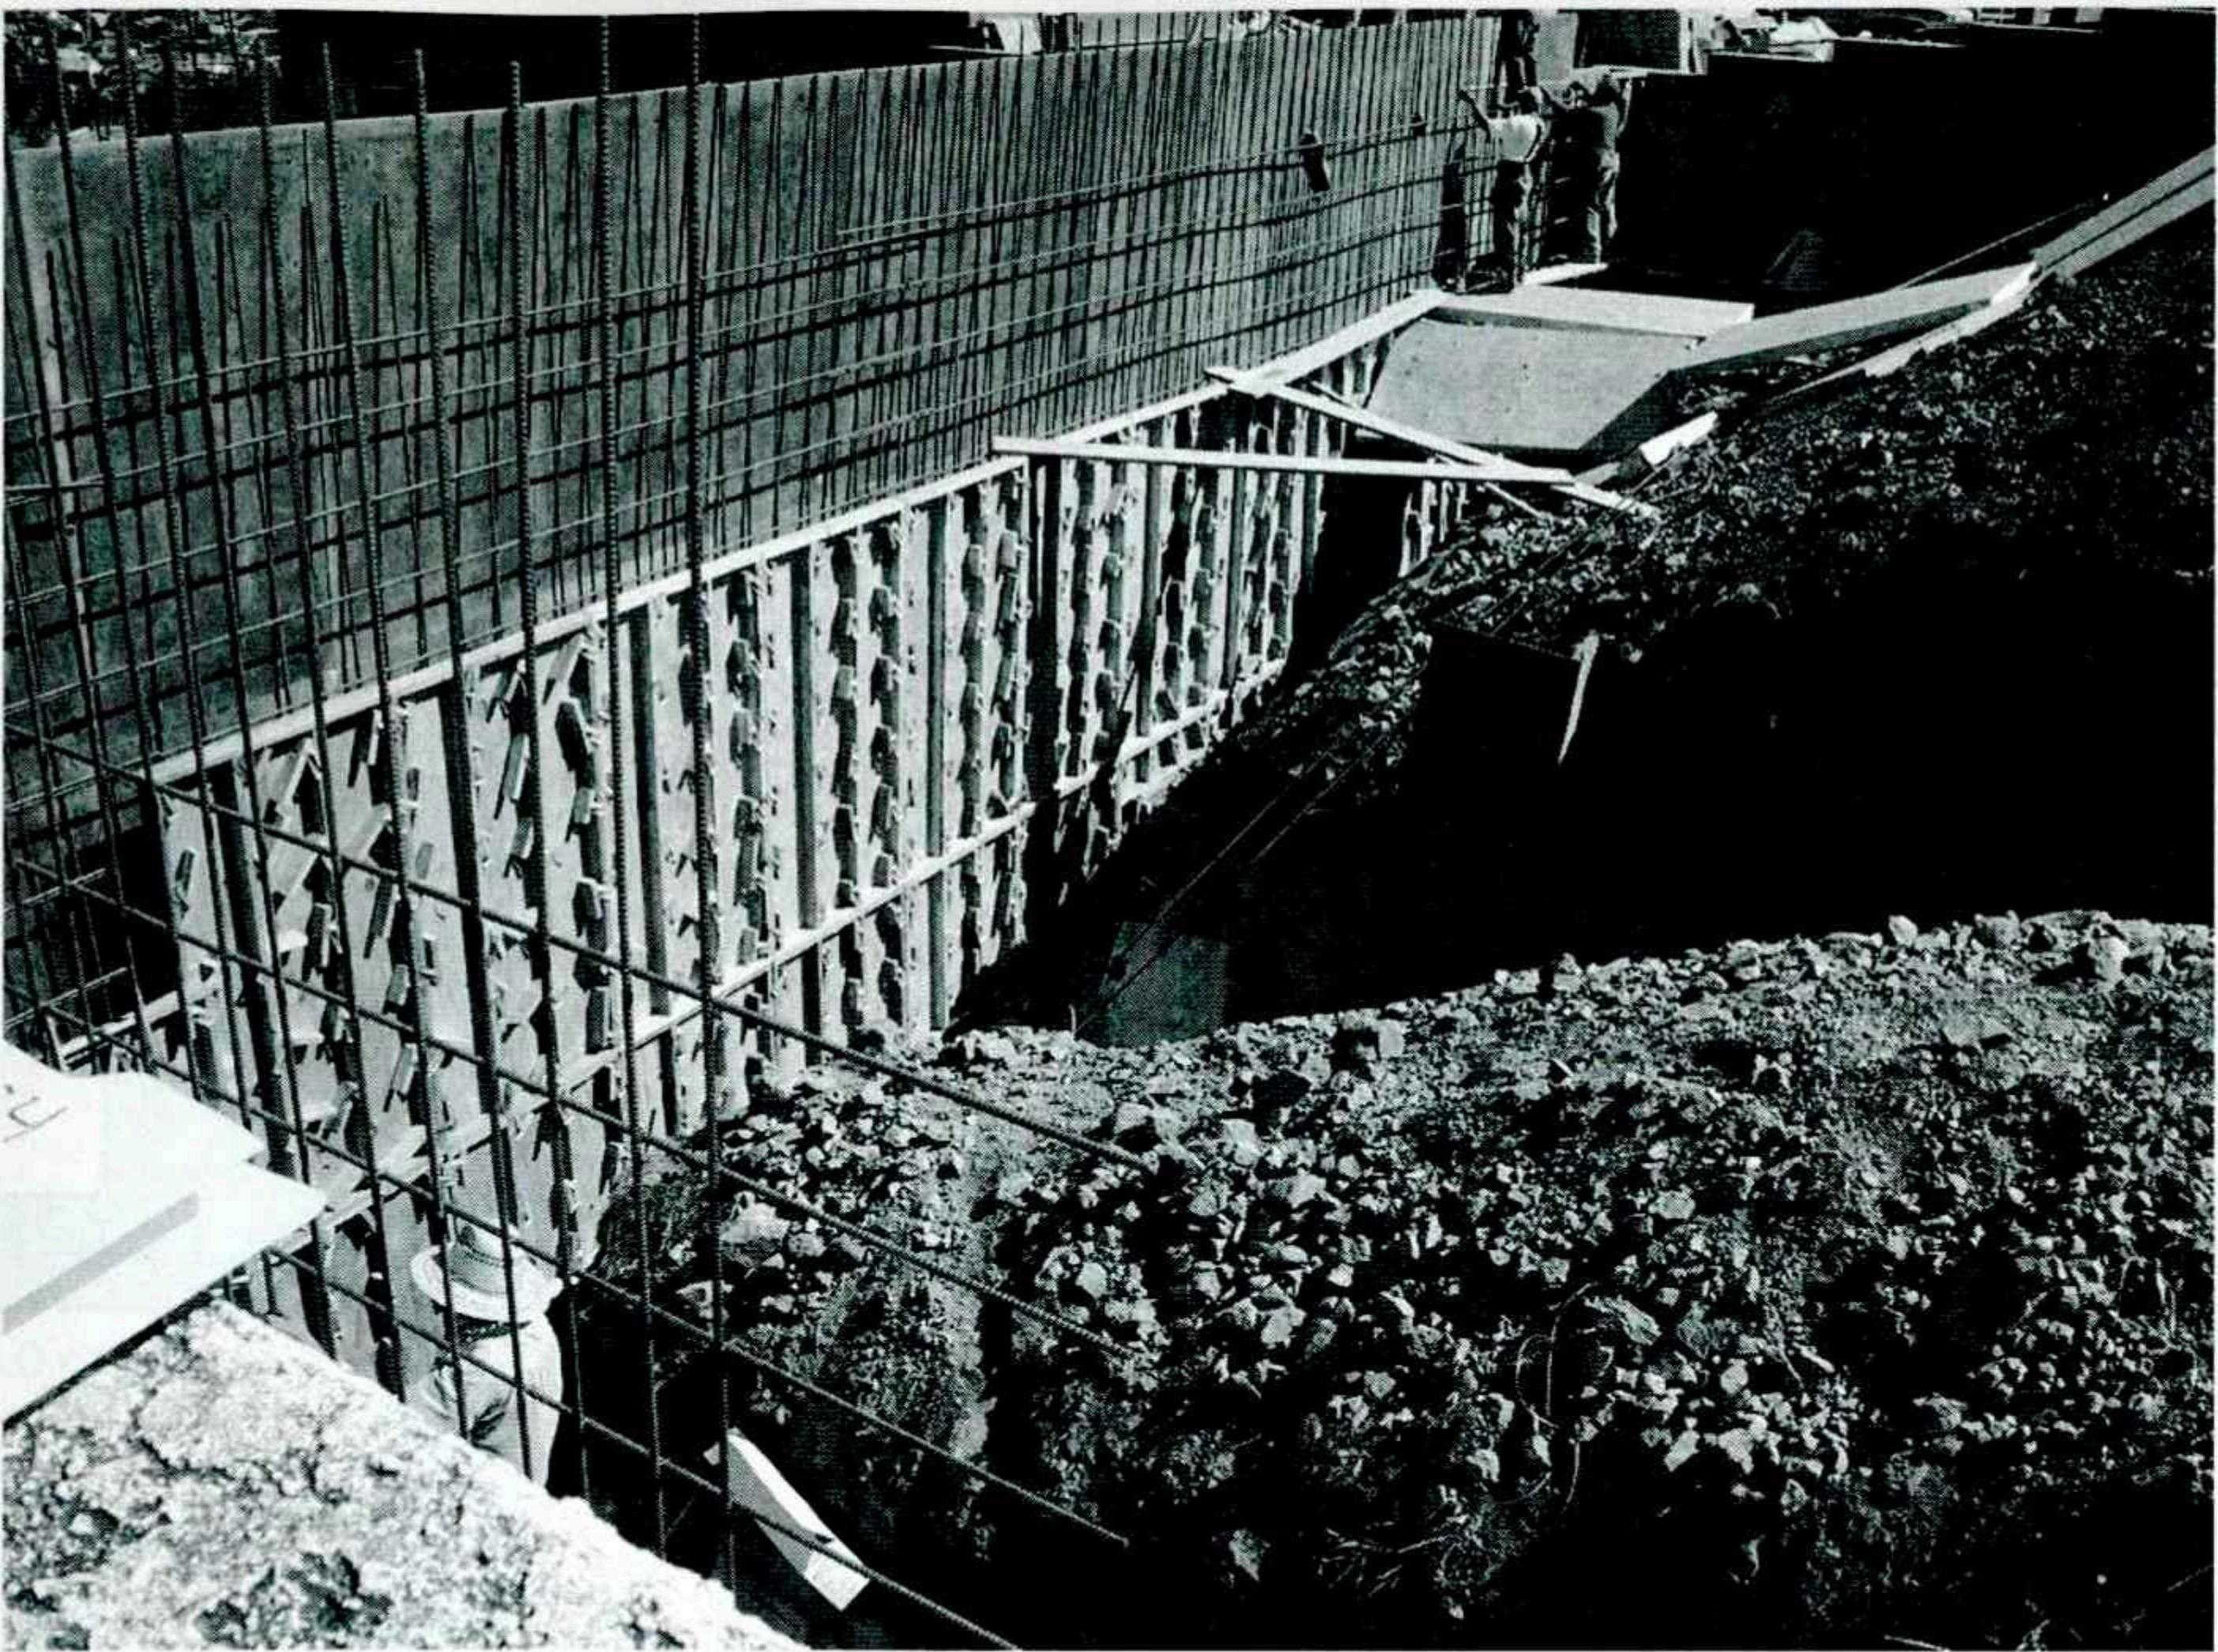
A cantilever retaining wall under construction (Courtesy of Dharma Shakya, Geotechnical Solutions, Inc., Irvine, California)
